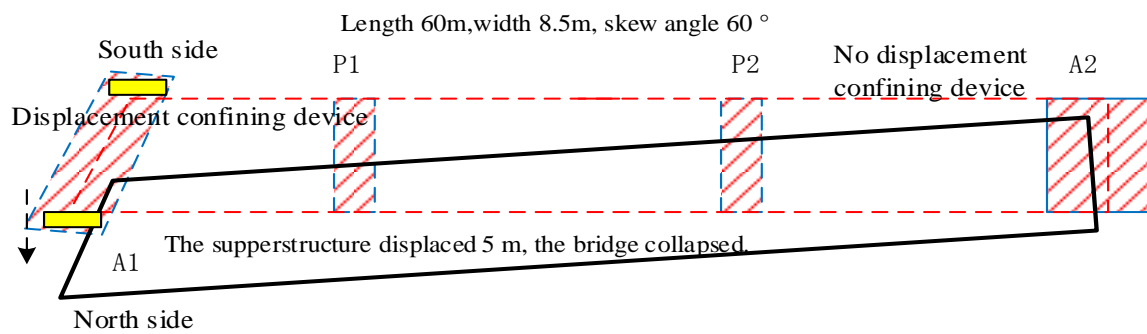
Plan view of the Furo Daiichi Bridge before and after the earthquake.
